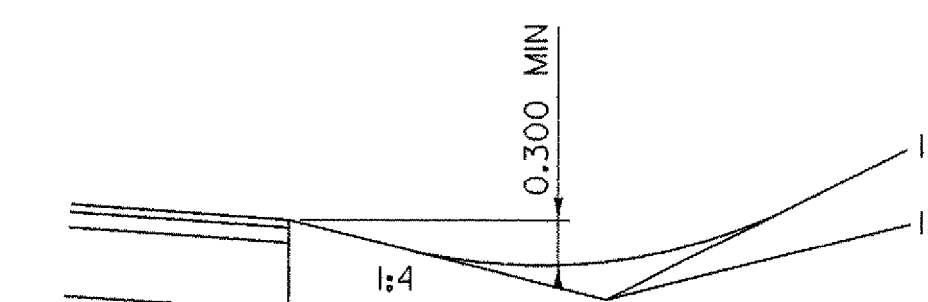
DETAIL OF GUARDRAIL ON HIGH SIDE OF BANKED SECTION
